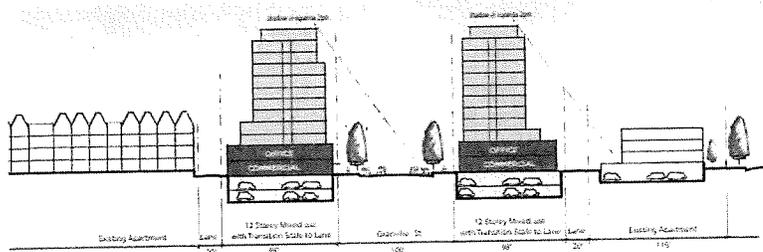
Cross-section diagram showing building heights and setbacks. The diagram illustrates a 12-story mixed-use building with a podium, situated between West 68th Ave and West 70th Ave. The building has a 2-story podium at the base and a 10-story tower above. The setbacks from the street are 20' on the west side and 10' on the east side. The diagram also shows existing adjacent buildings and a mid-block connection on the east side of Granville St.
